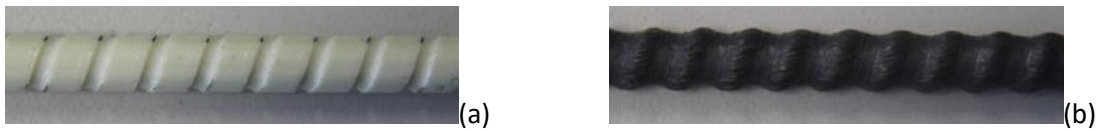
Rebars external surface: (a) Schöck ComBAR®; (b) FiReP® Rebar P.
